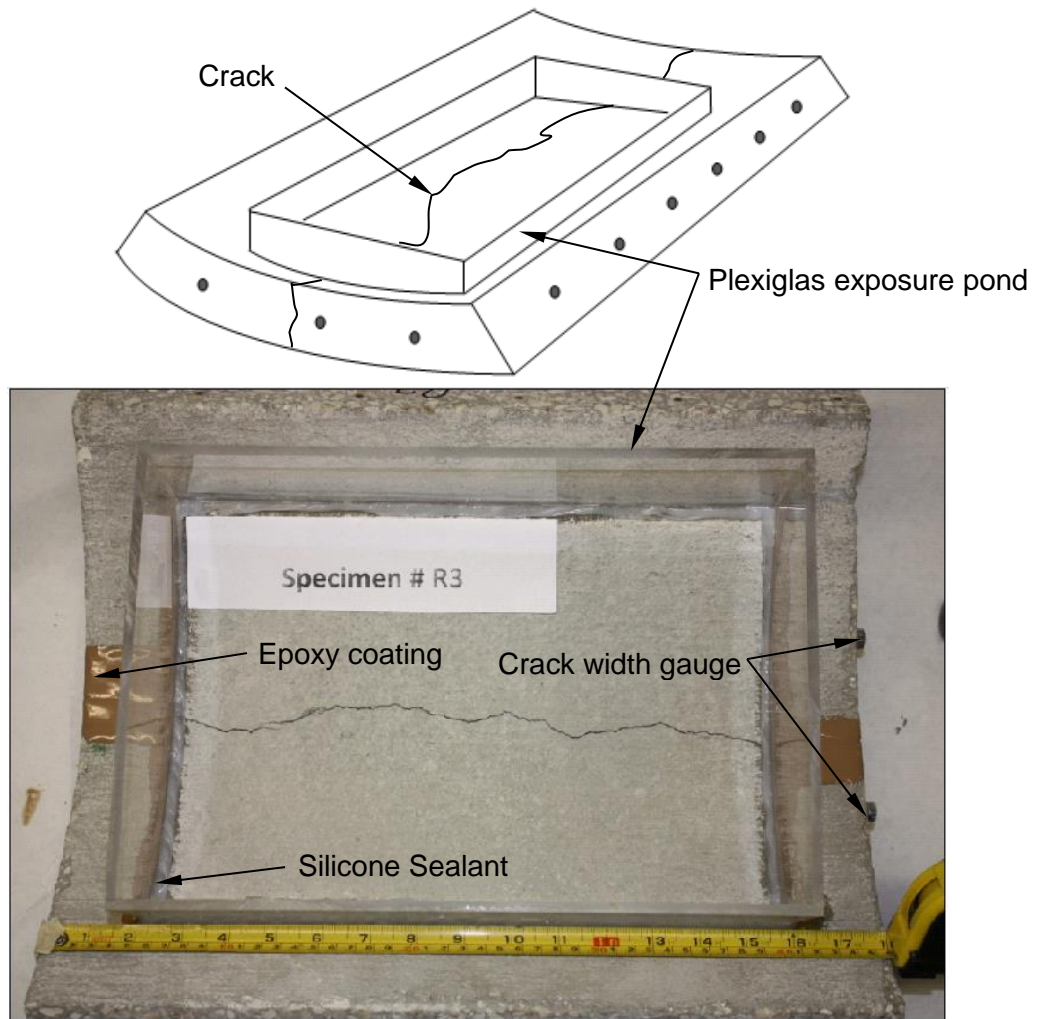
Ponding footprint exposed to test solution for the cracked and control specimens
